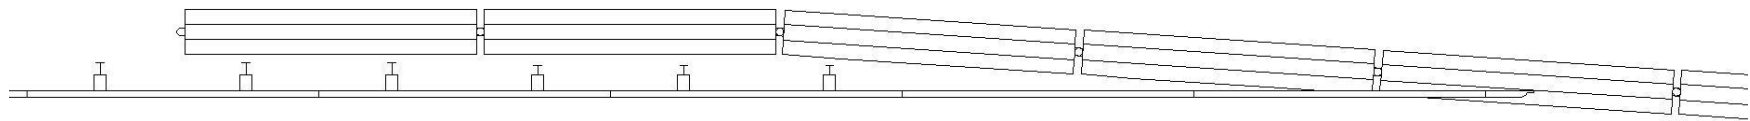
Flared PCB – Modified G4(1S) Design Concept
